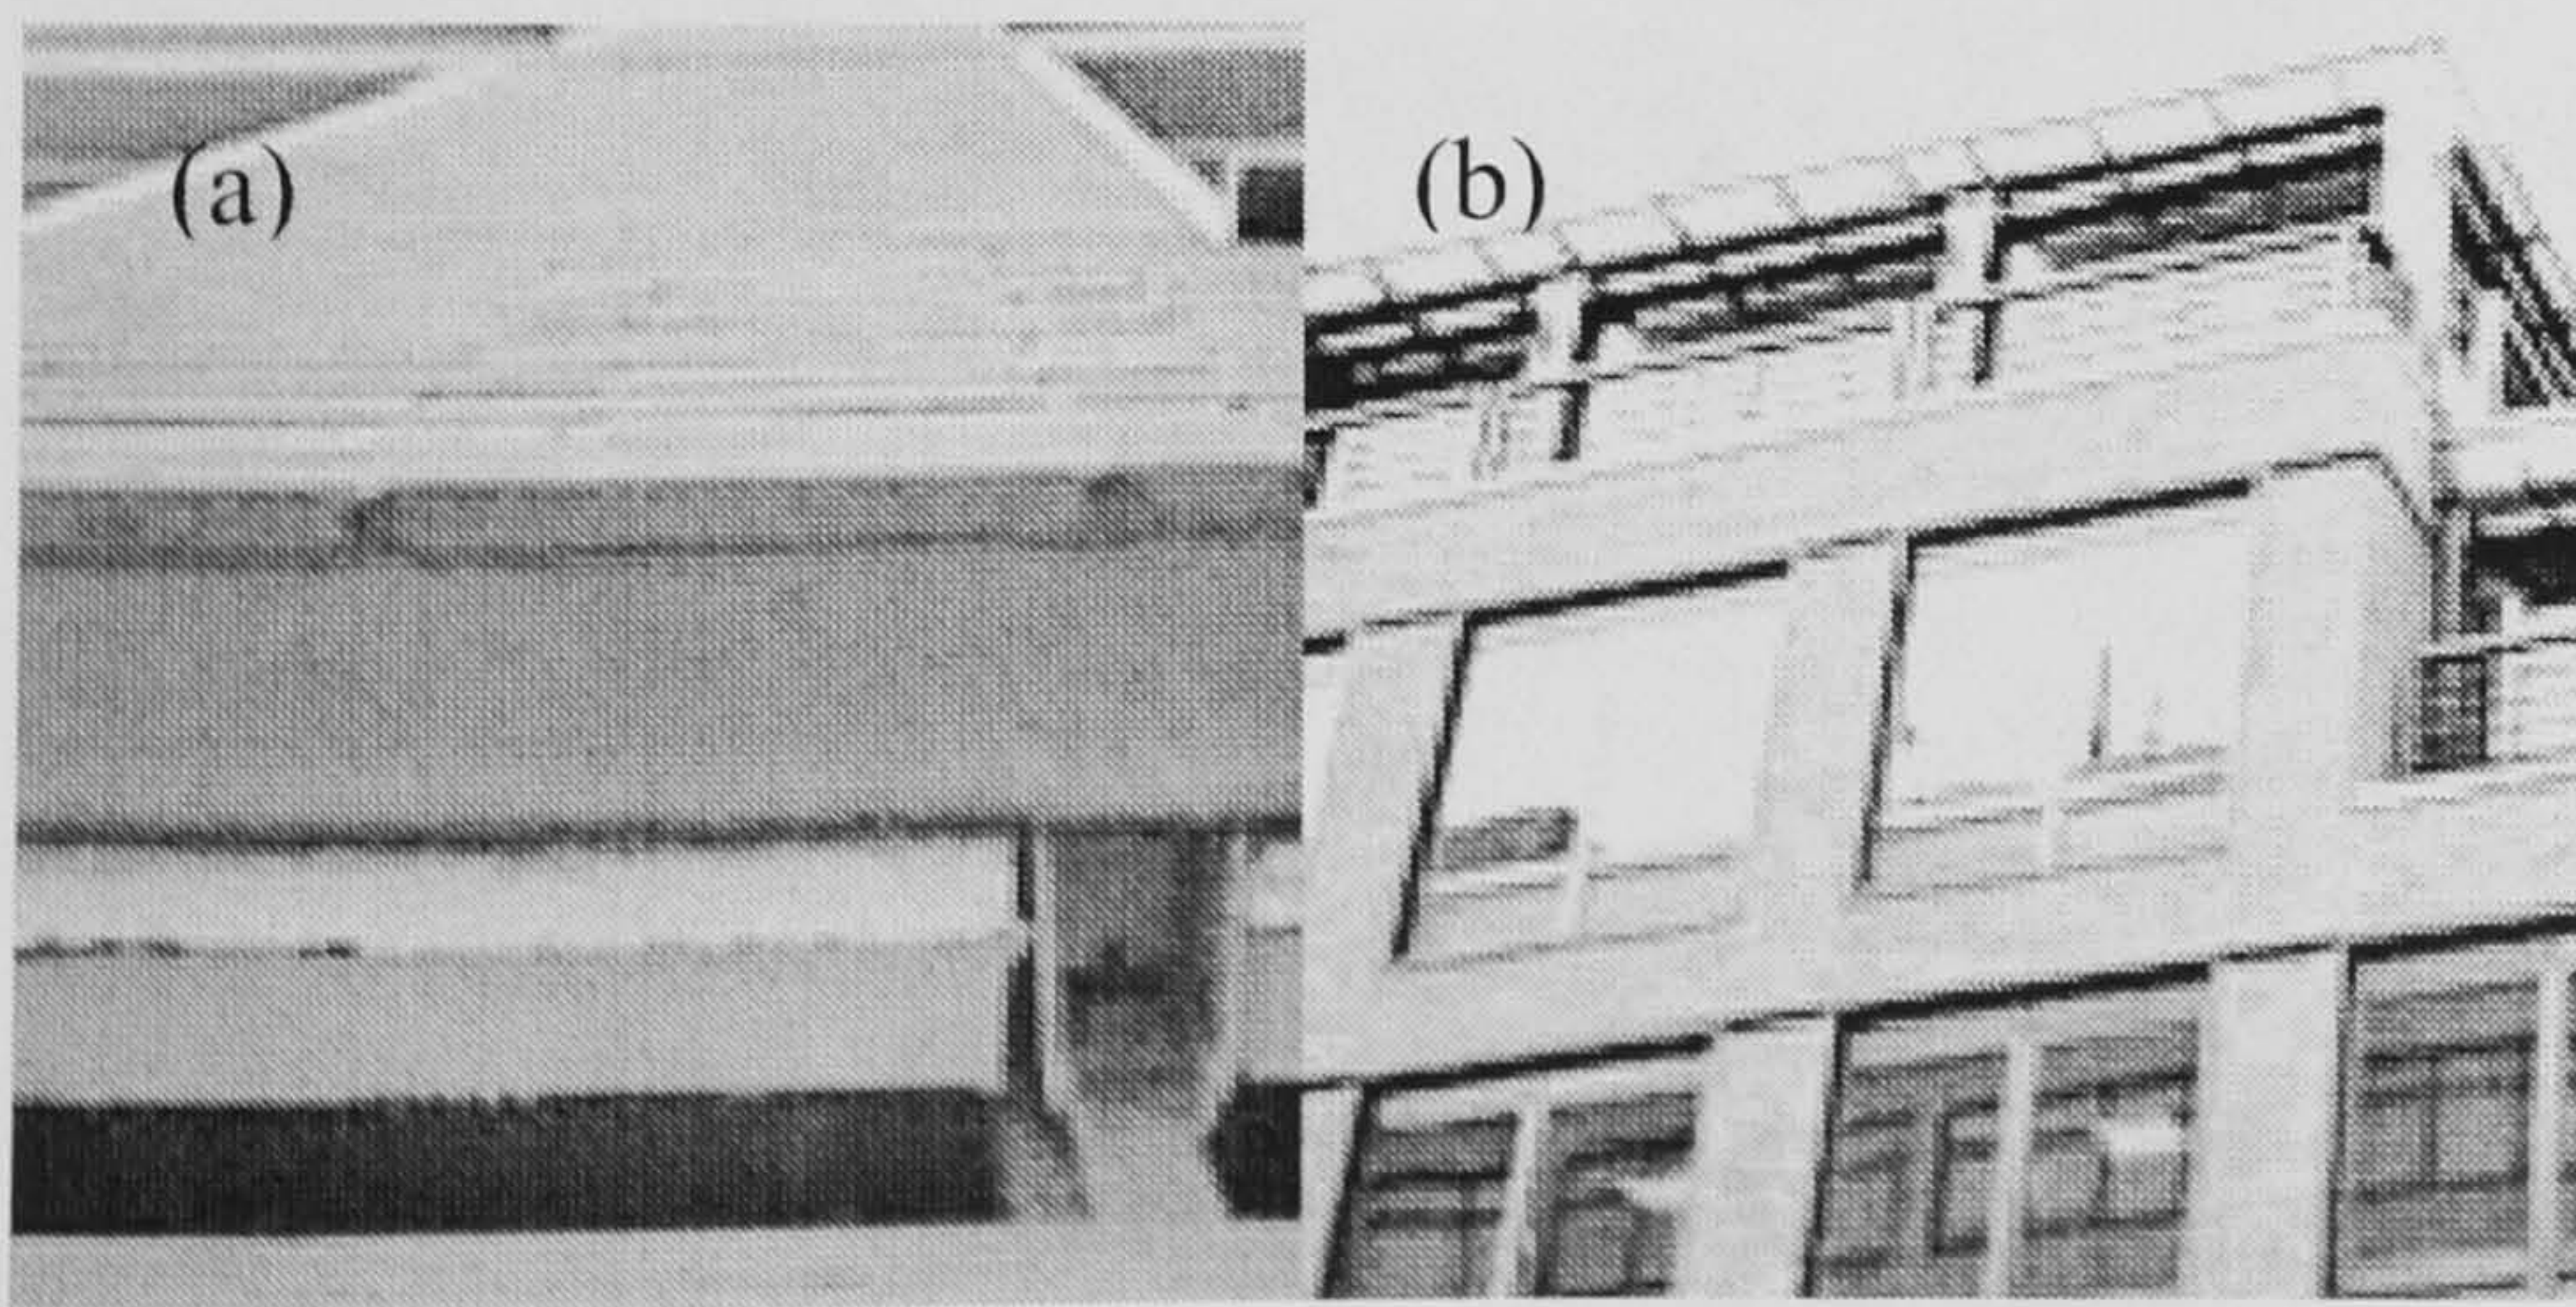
Brick faced concrete cladding, (a) in section (b) elevation.
